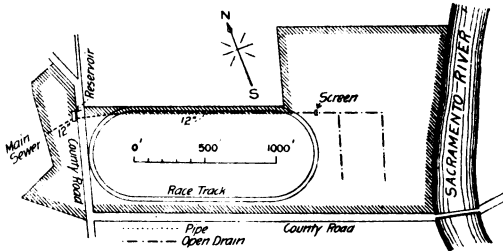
Plan of Sewage Farm, Redding, Cal.; S. F. Brackins, Engineer; Bassett & Touhey, Contractors
